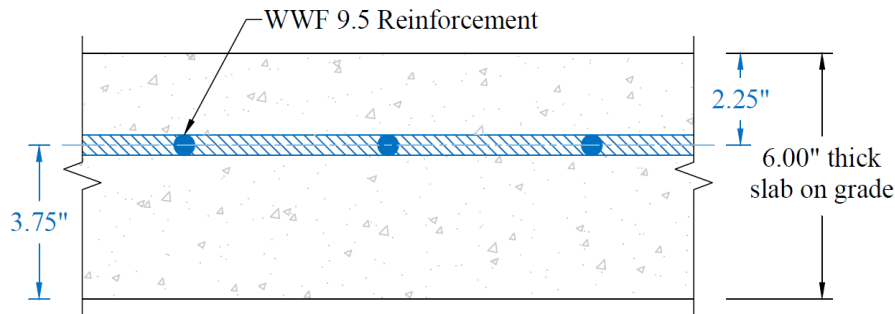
Design Parameters Input – Welded-Wire-Fabric (WWF)
